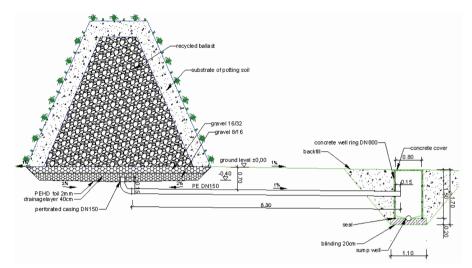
Typical wall cross section with substrate for vegetation and drainage blanket at the base.
